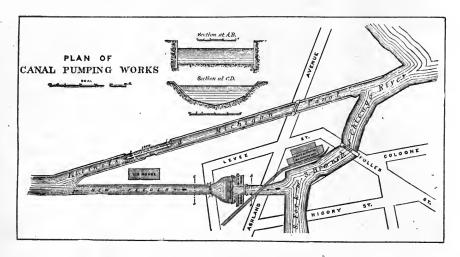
FIG. CCXV-Ground Plan of Canal Pumping Works at Bridgeport.
